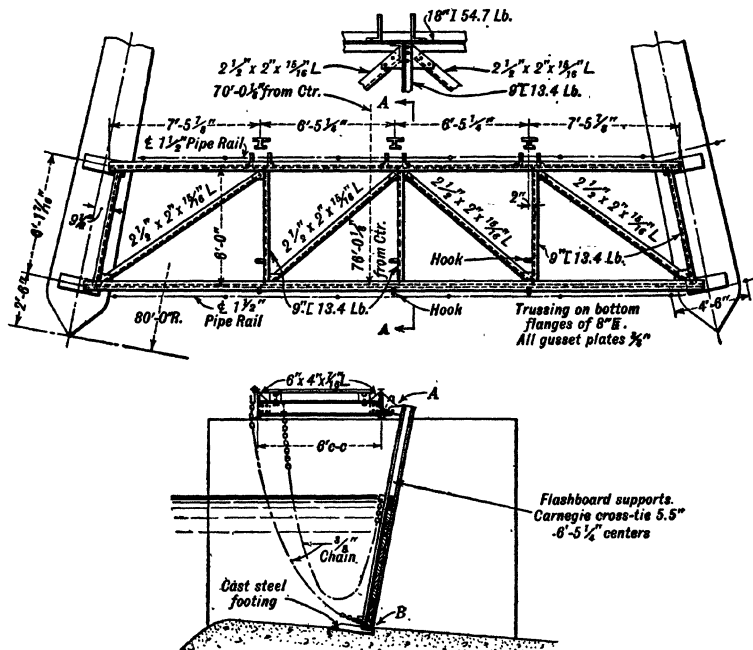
Details of Flash-board Device, Davis Bridge Spillway.
